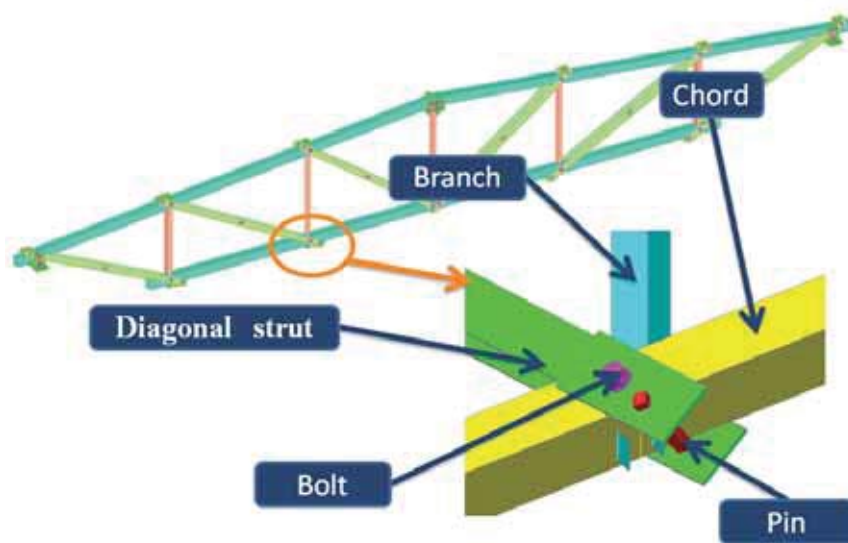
View one selected joint (with pin) type N from non-welded truss.
